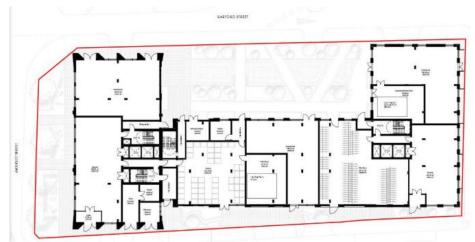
Plot 1 - Ground Floor Plan (Source: Dwg ref. 20039-GNA-P1-00-DR-A-1100 Rev C)
